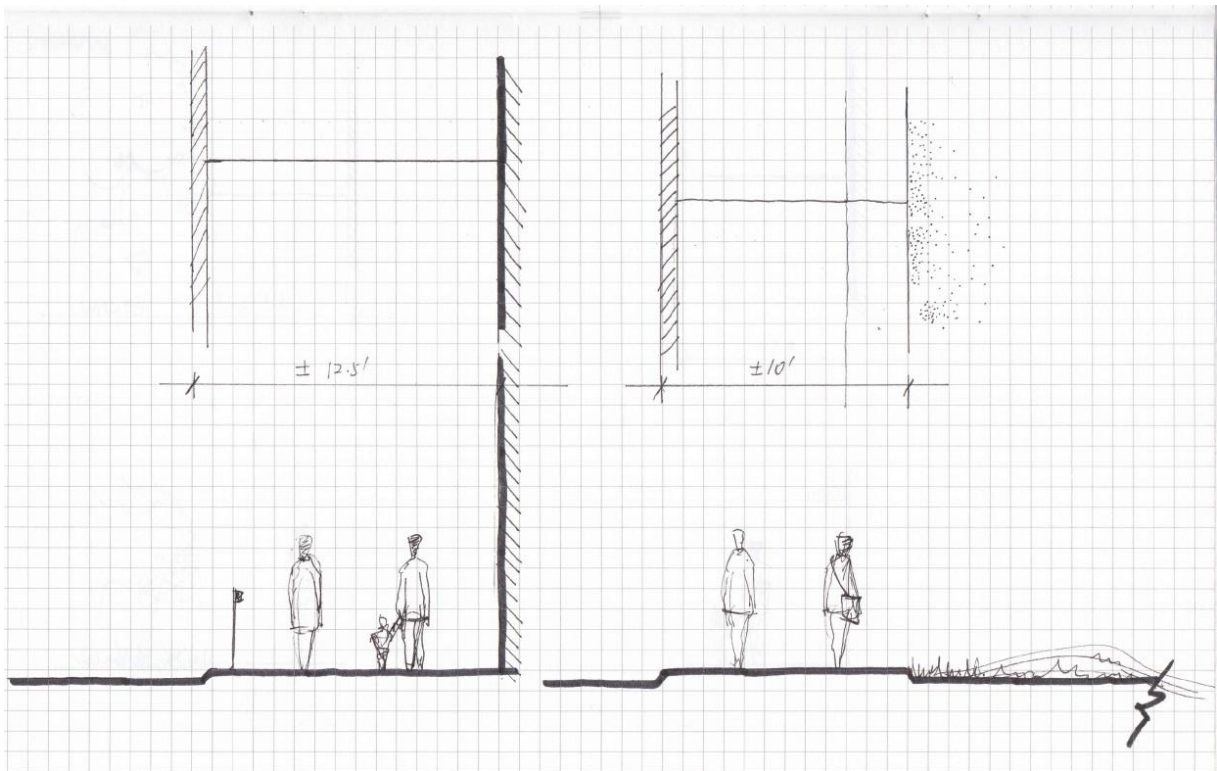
Plan and section of pedestrian on Parc Avenue
